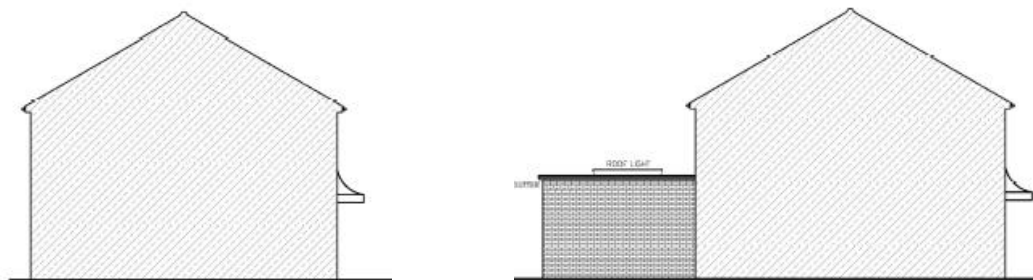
Existing side elevation (left) and Proposed side elevation (right).
